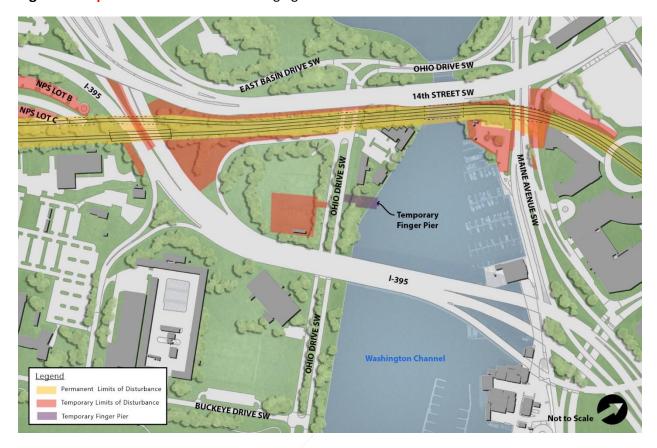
Action Alternative A Construction Access and Staging Locations – Potomac River
